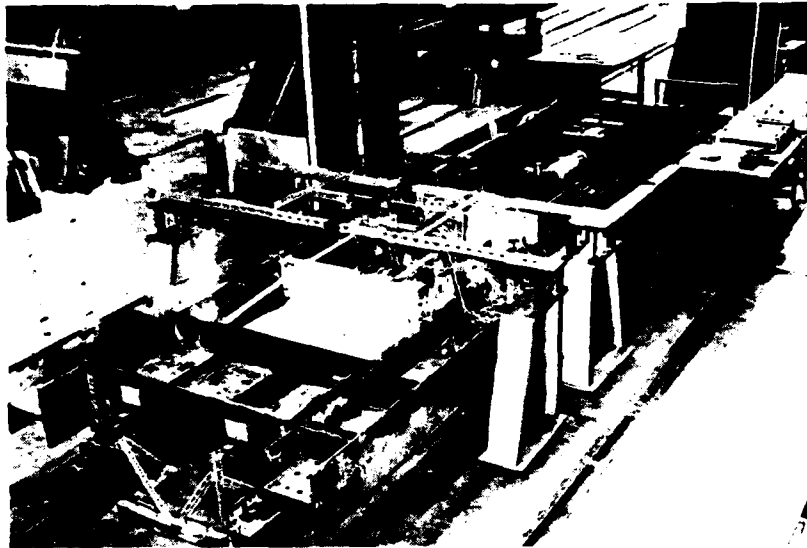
(790585-2) Overall View of Completed Three-Bay Element Test Setup
